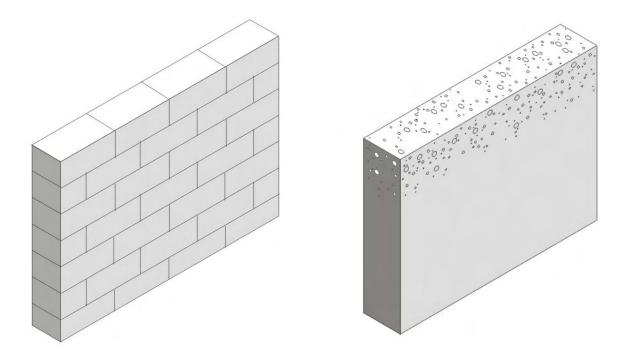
Solid Unit Masonry (left) and Solid Concrete (right) Walls
